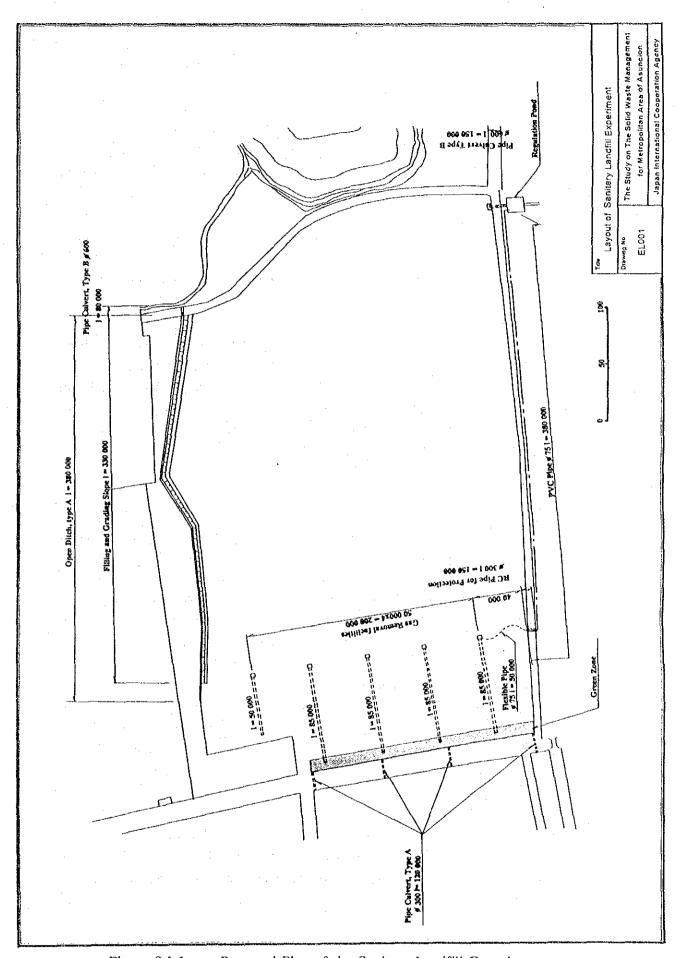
Proposed Plan of the Sanitary Landfill Experiment
